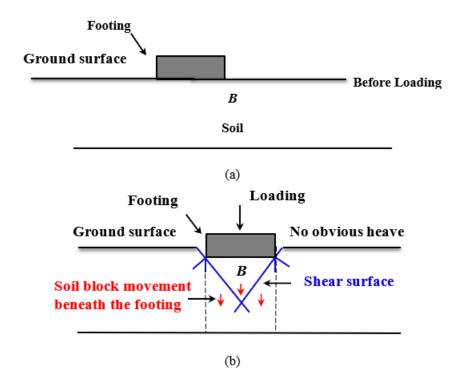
Schematic of common punching failure mechanism in unsaturated fine-grained (UFG) soils beneath the foundation: (a) Before loading; (b) During loading
